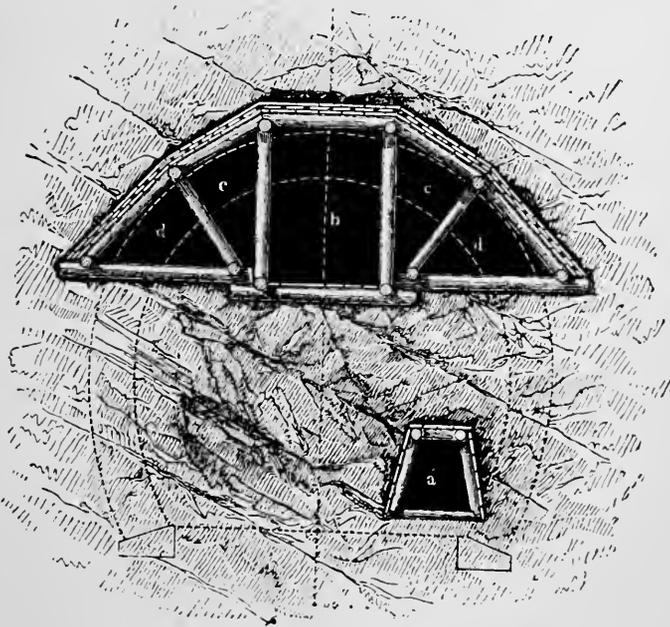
TIMBERING FOR TUNNEL HEADING.
